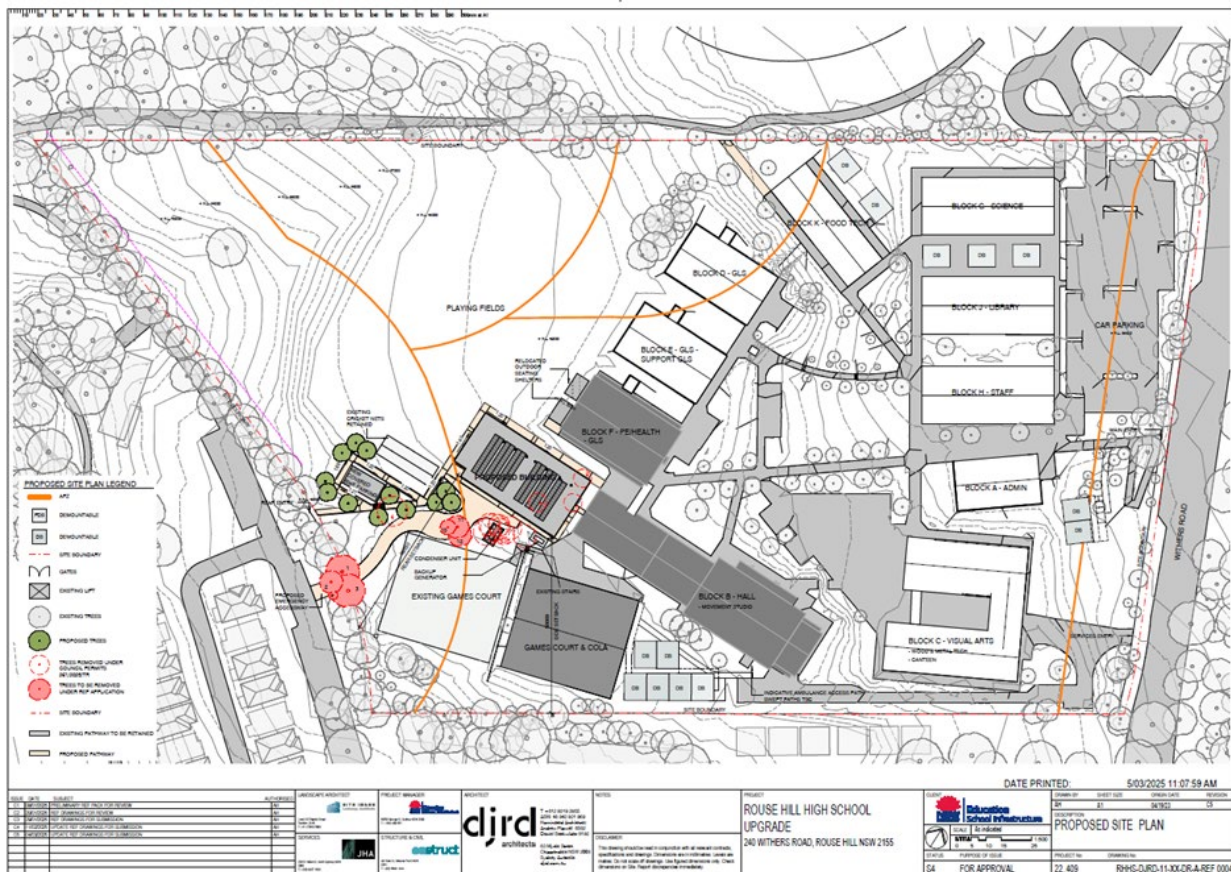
Rouse Hill High School Upgrade Concept Plan
